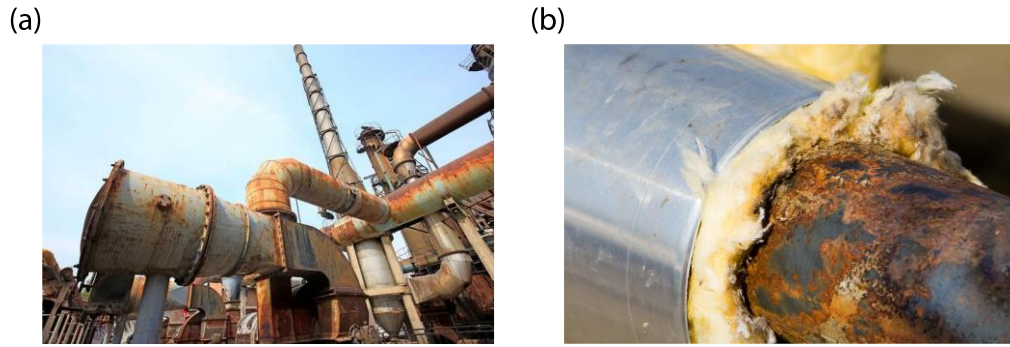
Examples of corroded and degraded pipework within the oil and gas sector. (a) Elevated pipework with general atmospheric corrosion [62]. (b) Insulated pipe with cladding removed to show corrosion under insulation [63].
